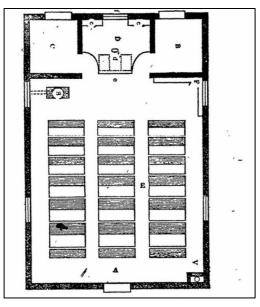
Prospective one-room schoolhouse floorplan (*The School House, Its Architecture, External and Internal Arrangements*, p. 45)
